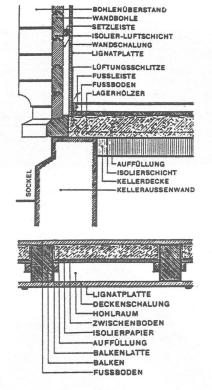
Christoph & Unmack, standard details of log building system for wall (Fig. 2) and ceilings (Fig. 3) (Wohnhäuser)
